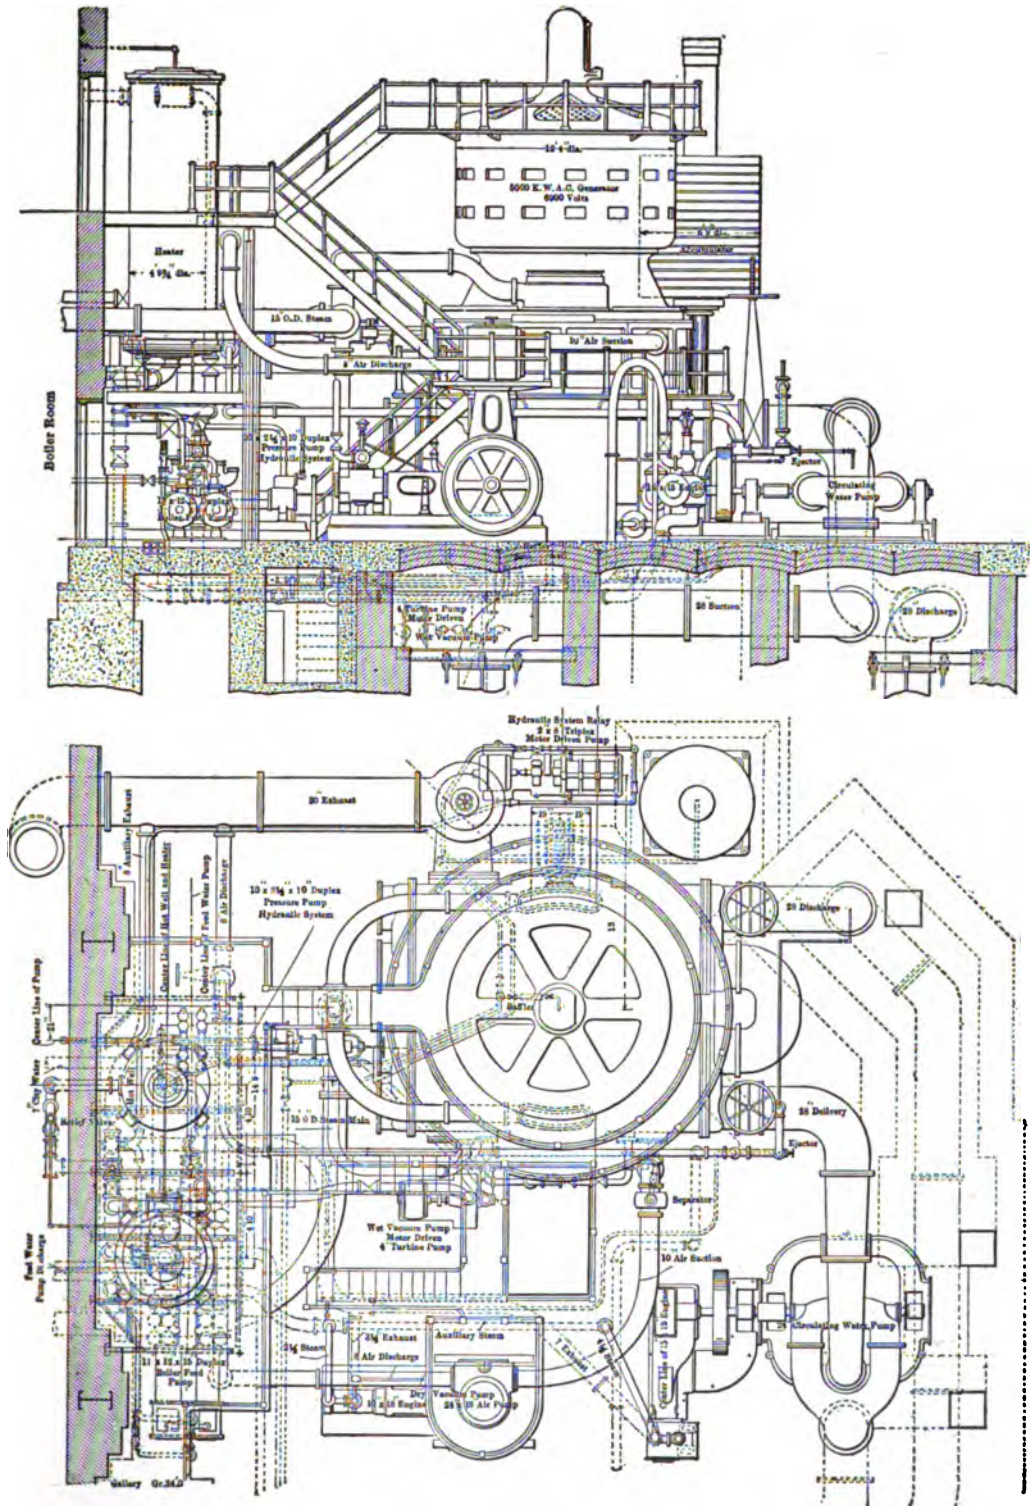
Plan and Elevation of one 5000-K.W. Turbo-Generator Unit with Auxiliaries, L. Street Plant, Boston (*Power*).
